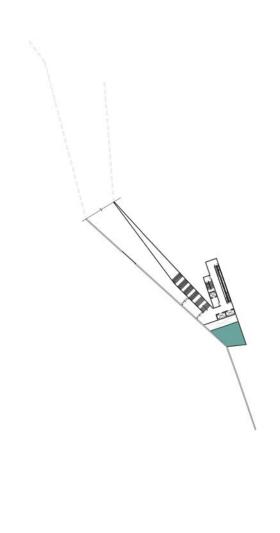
2nd Floor Plan, Scale: 1/1500
